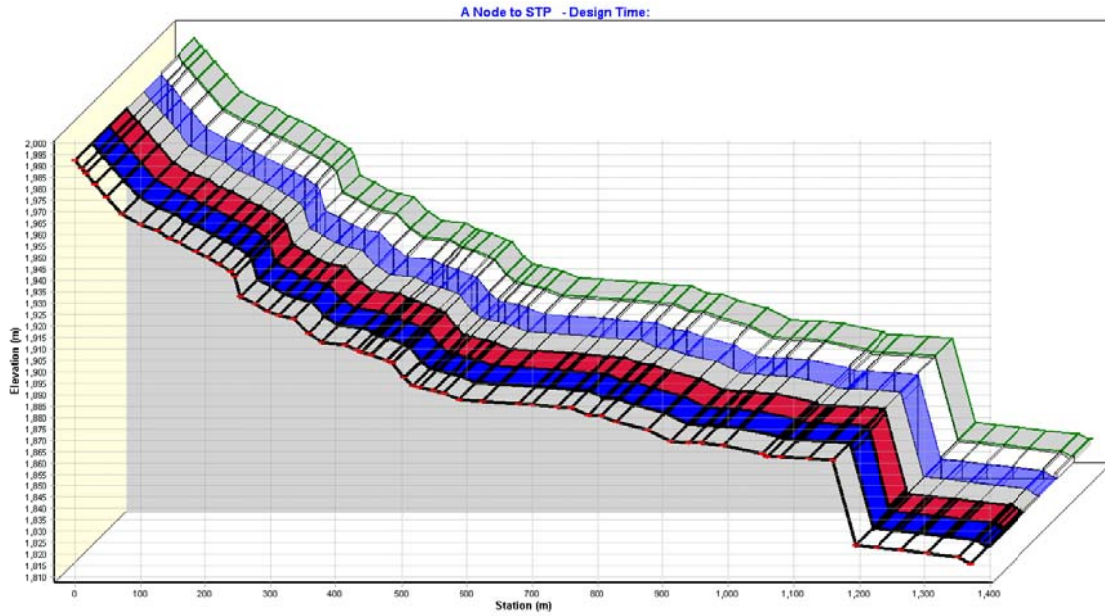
A 3D View of Manhole, Conduits and Out Fall From point A to the STP
